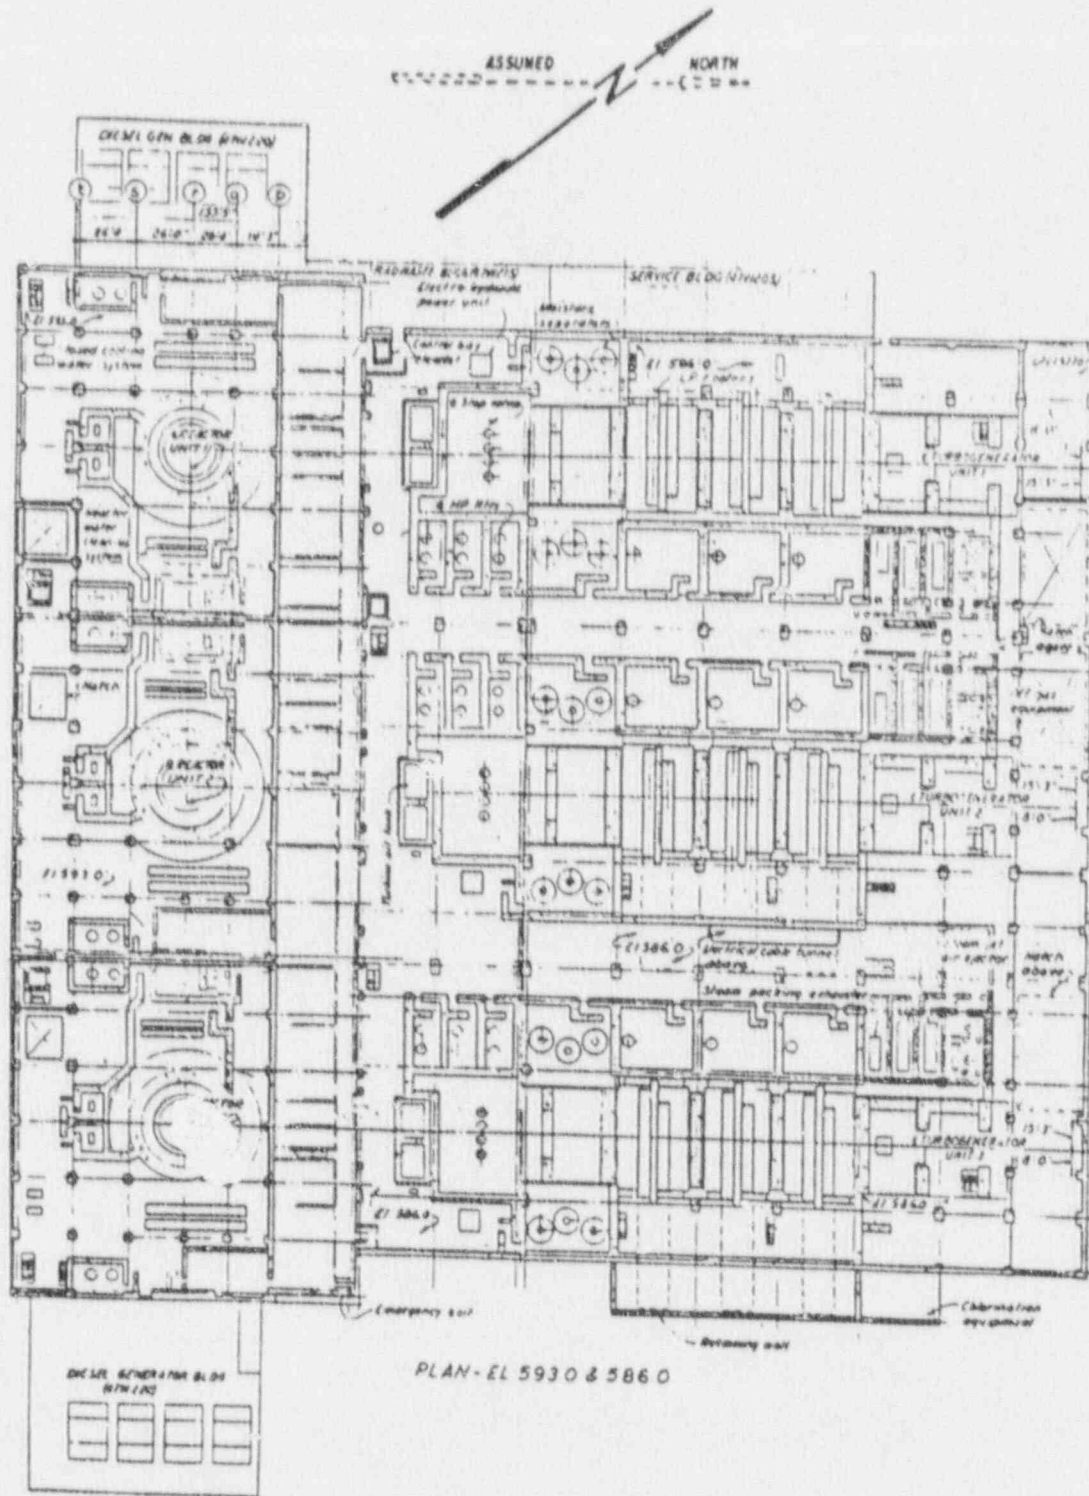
Overall Layout of the Browns Ferry Nuclear Plant, Elevations 586 ft. (Turbine Building) and 593 ft. (Reactor Building)
